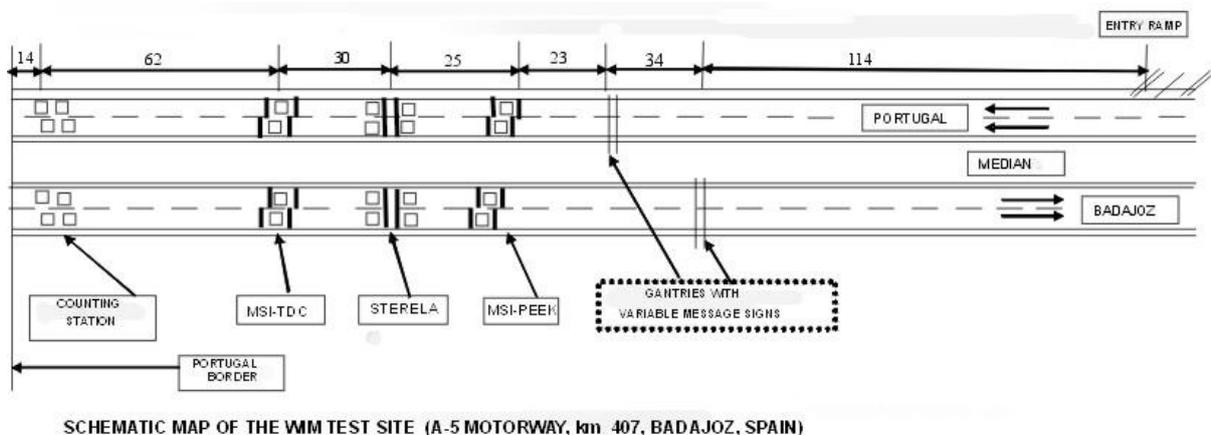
Layout of the WIM systems tested in the A-5 at Badajoz site.
